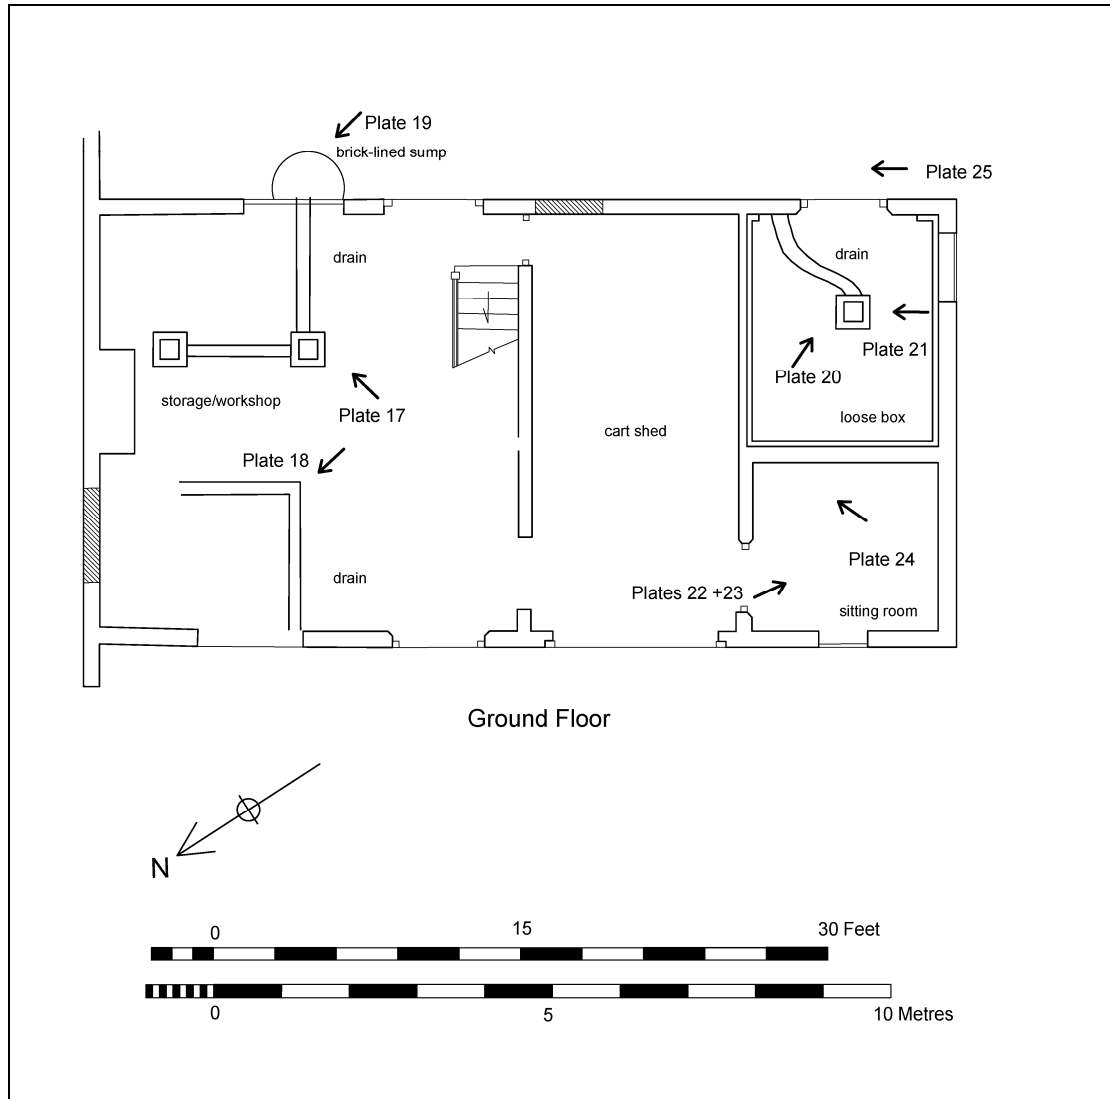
Ground floor plan with exposed drains and locations of photographs taken during the watching brief.
